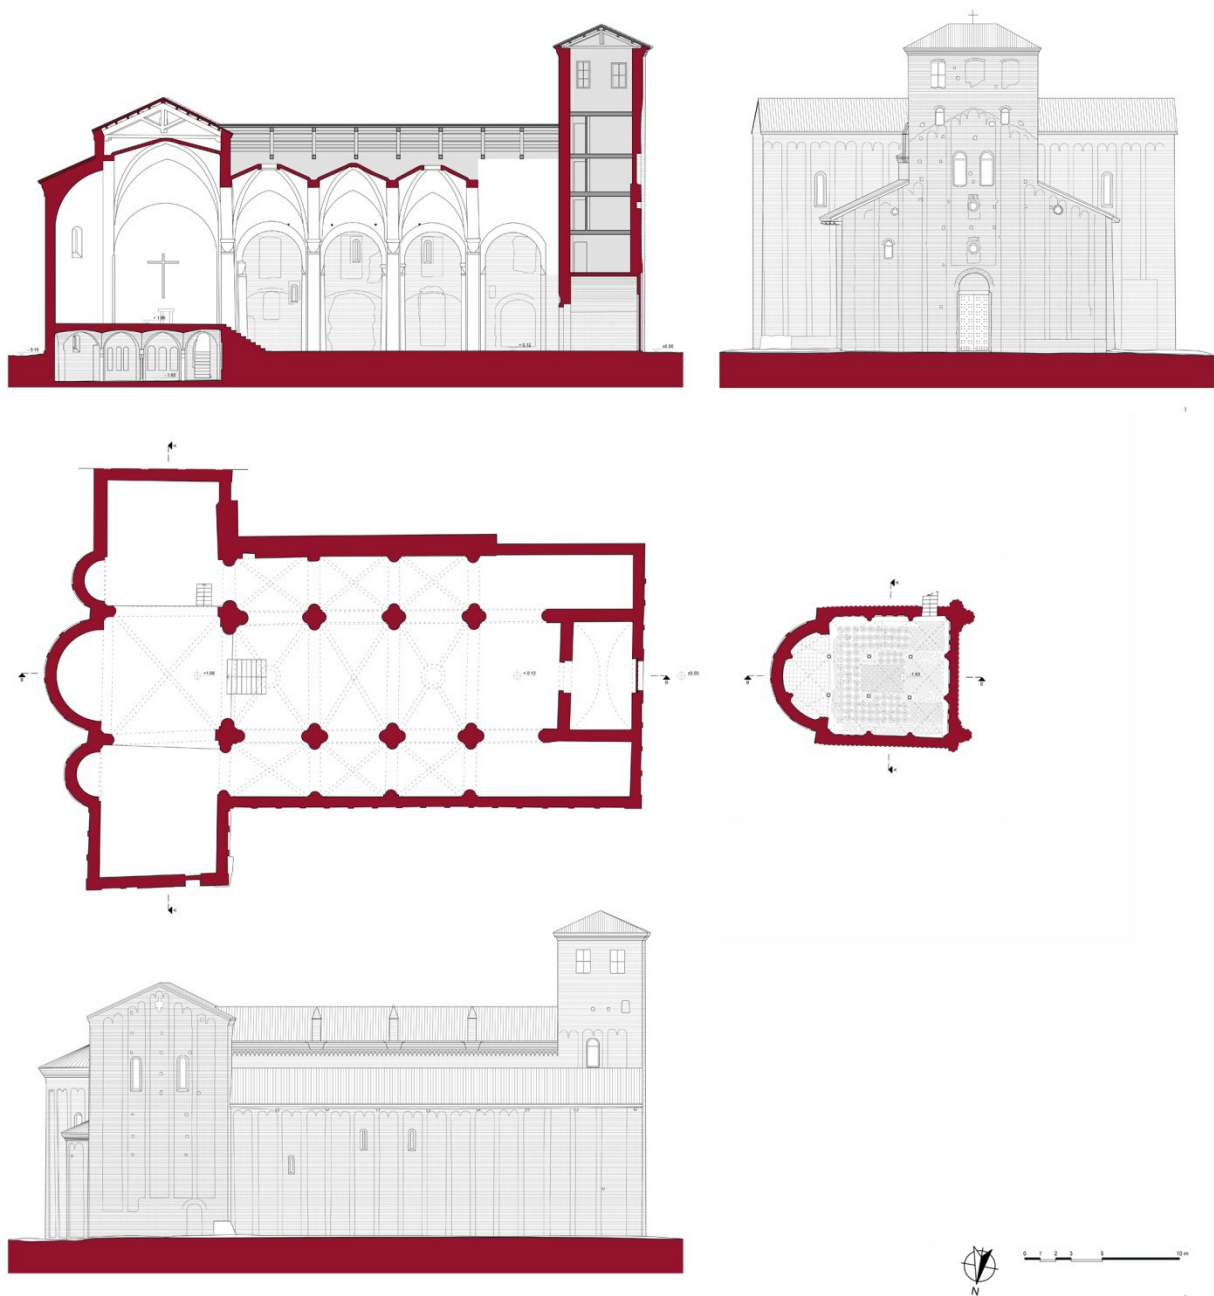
Plans, elevations, section of Santa Giustina Abbey. Original scale 1:100. Drawing by Alessandro Piovano.
